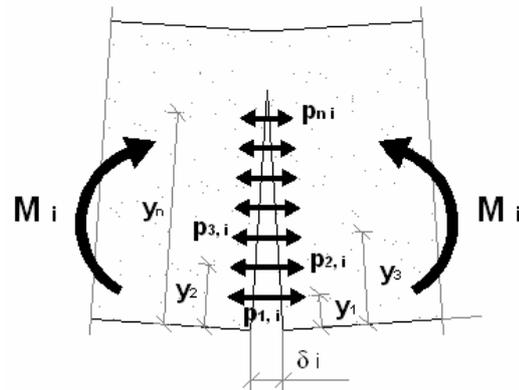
Scheme of internal forces and moments formed in fiber concrete beam at post-cracking stage
